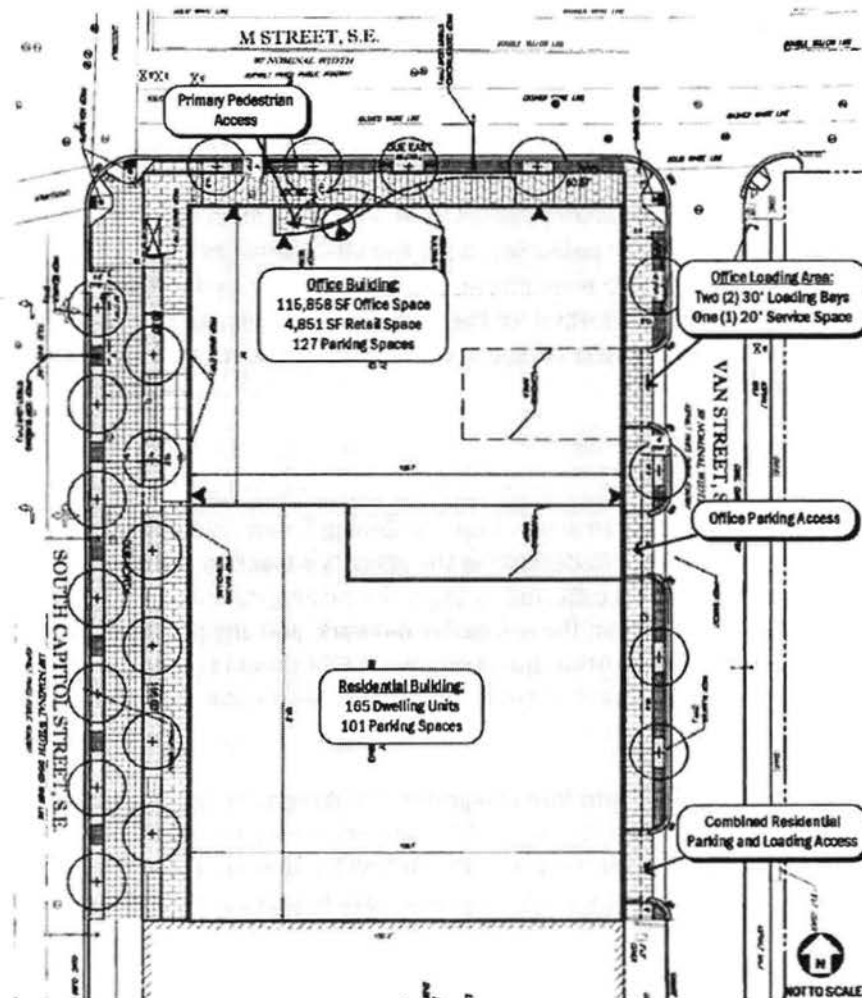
Site Design and Access (Source: Grove/Slade Associates)
